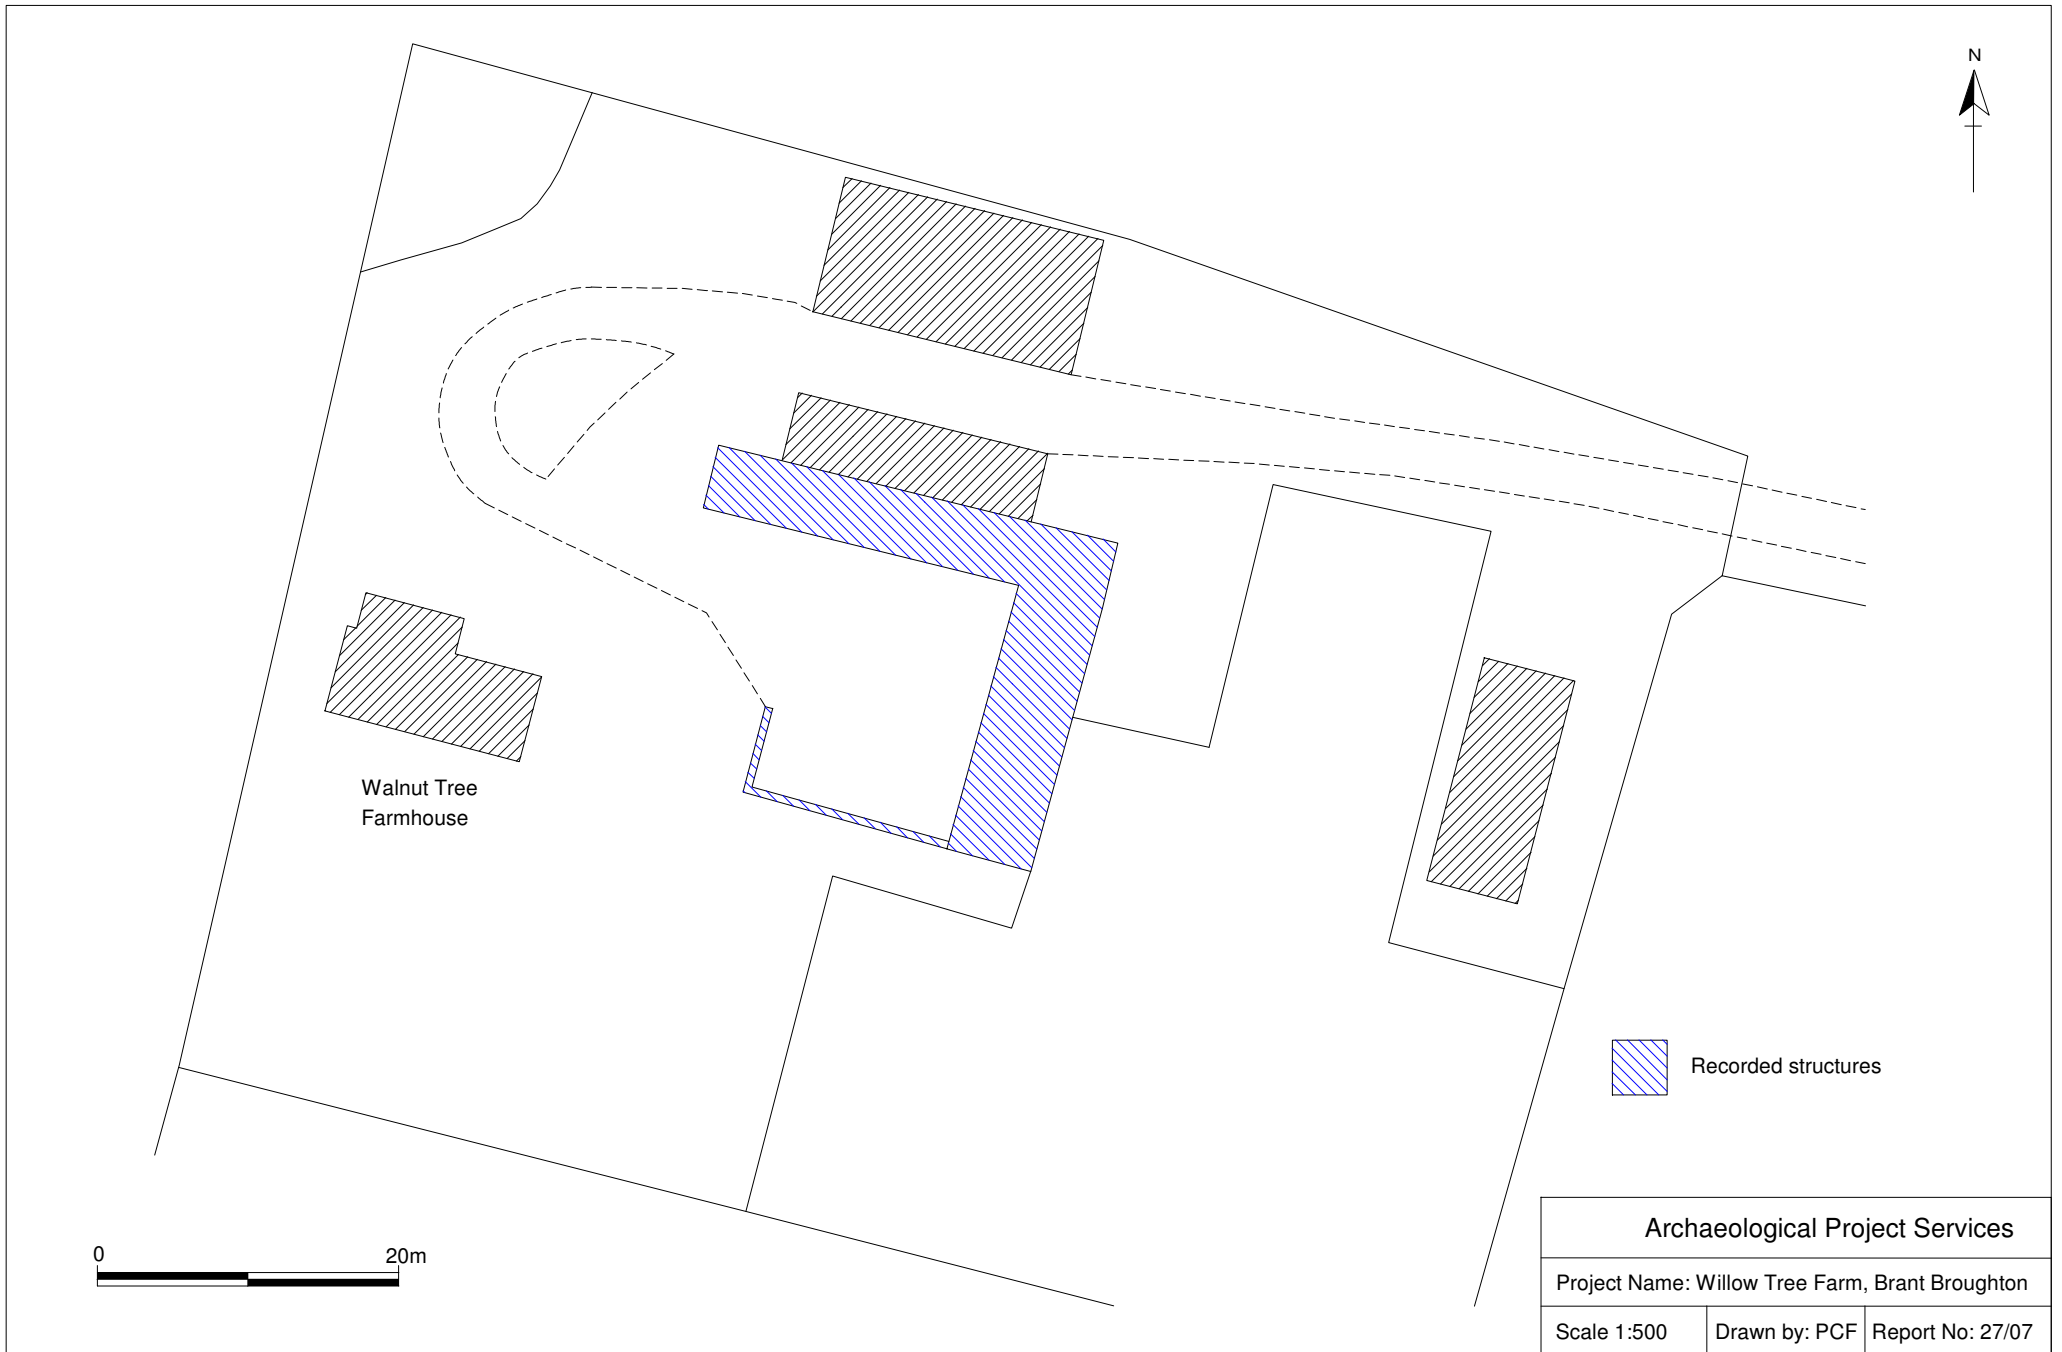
Plan of Walnut Tree Farm showing location of recorded structures
